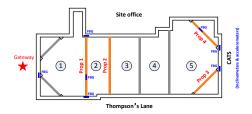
Layout of the instrumented temporary props, sheet piles and sensor network at Trinity Hall site
